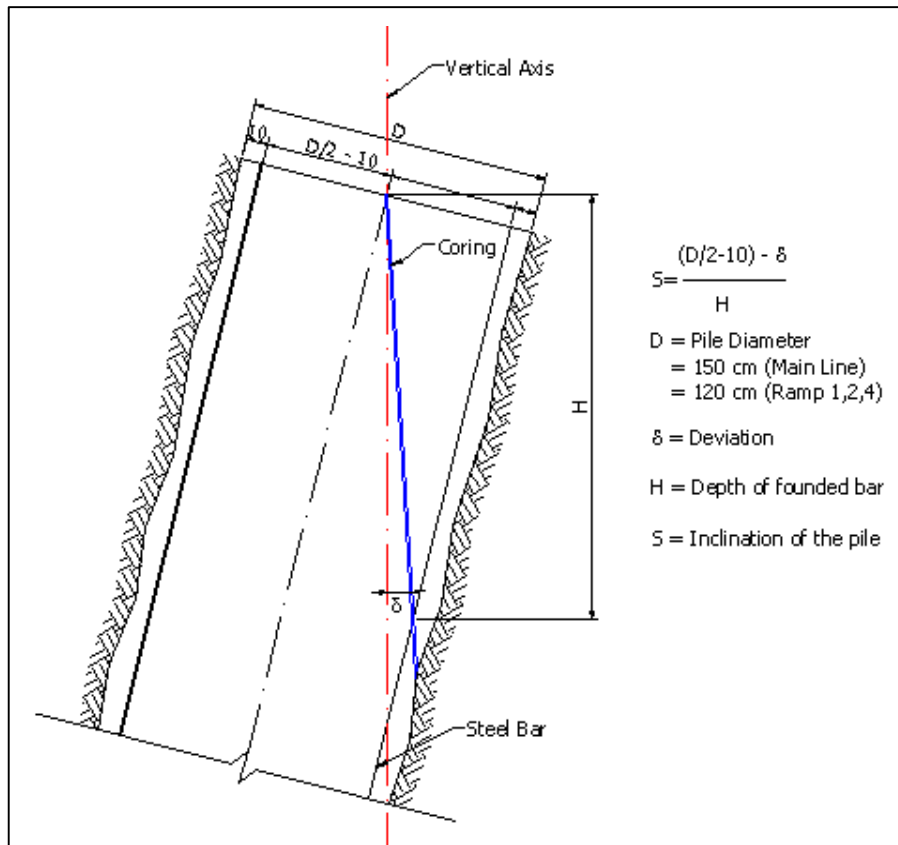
Coring of pile for locating cracks and measuring pile's inclination
